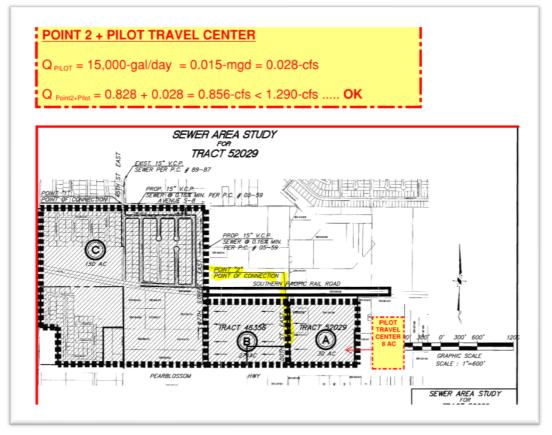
Pilot Travel Center added to PC 05-65 Sewer Study
